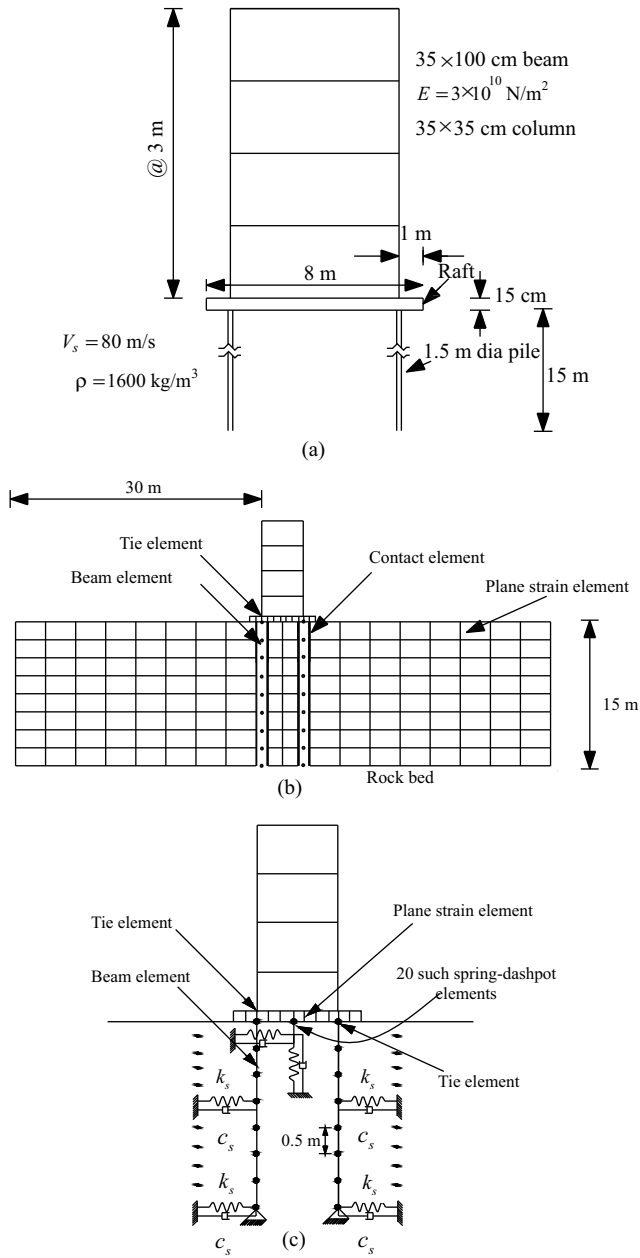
Pile founded building frame: (a) properties; (b) modeling of soil–pile frame together; and (c) modeling by replacing soil by spring–dashpot
